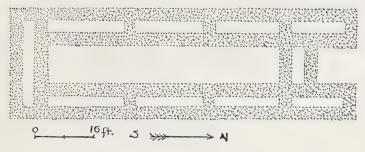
Tikal: Plan of earthwork, called Structure 3.
